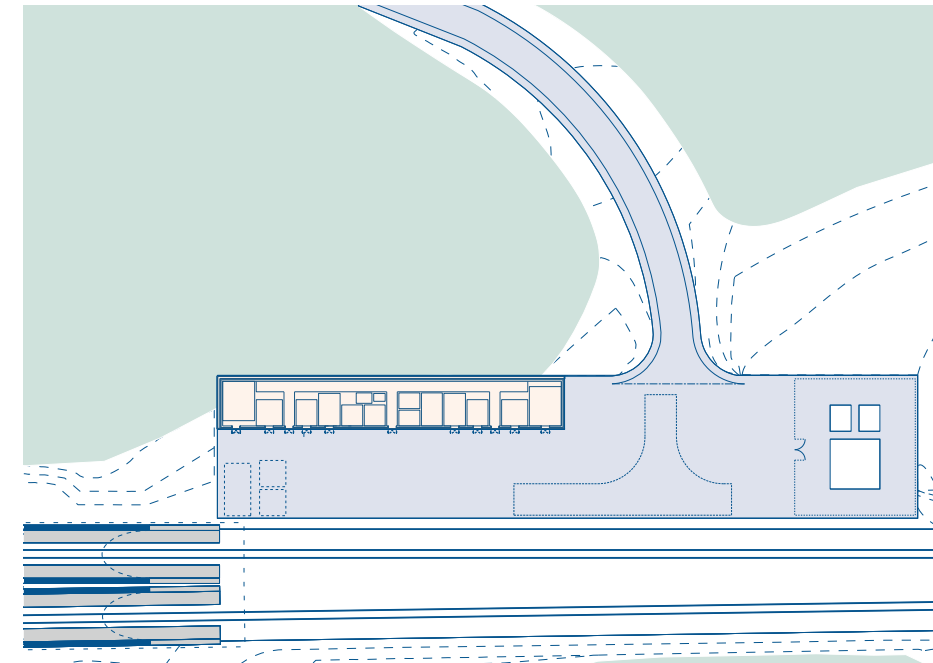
\_ Site plan - Long thin building built up to retained earthworks
